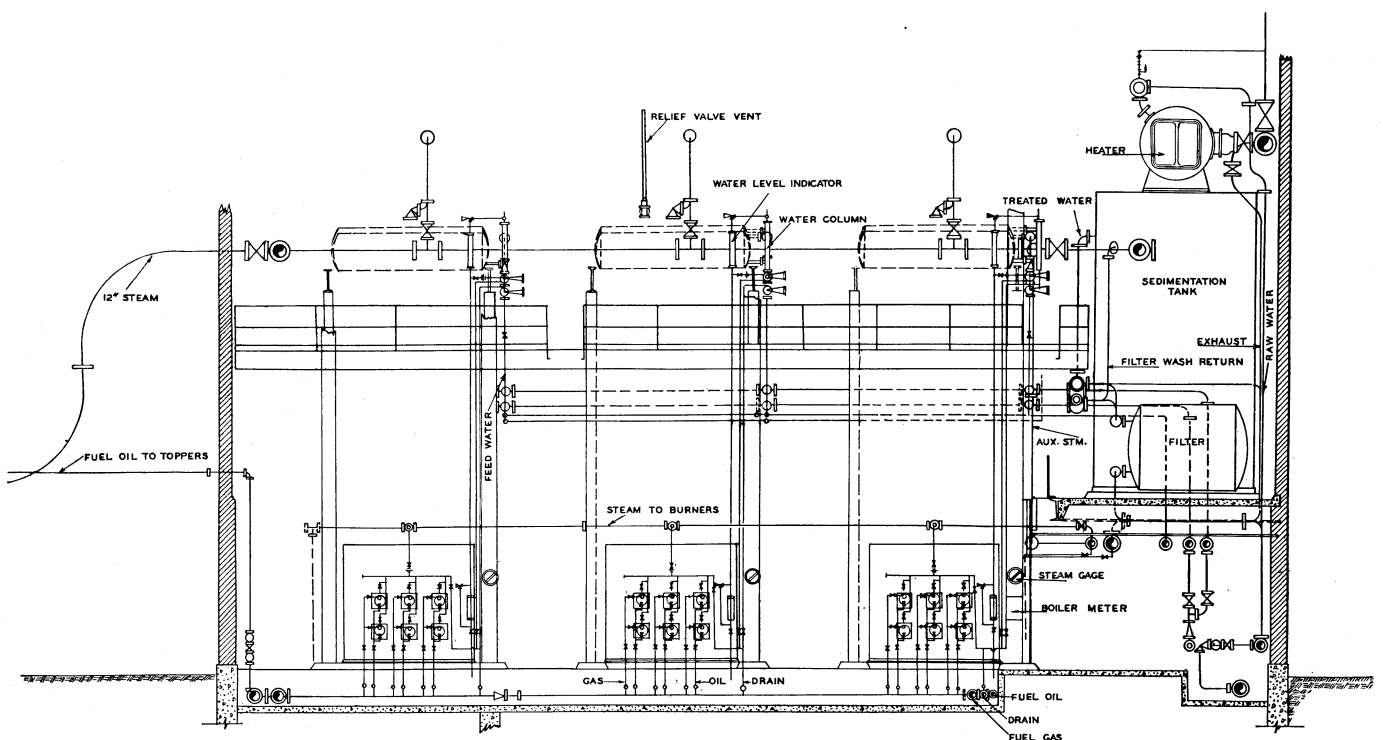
FRONT ELEVATION OF BOILER PIPING
